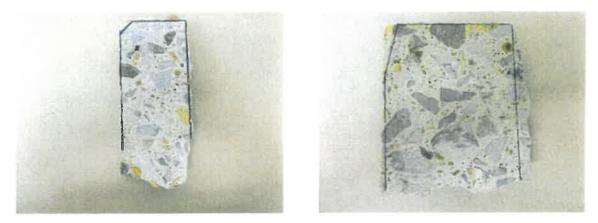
Sawn surfaces of Core #3 from bridge deck (Lab No. 6650) (left) and Core #4 from bridge deck (Lab No. 6651) (right) after application and rinsing of Los Alamos stains. No ASR is apparent.
